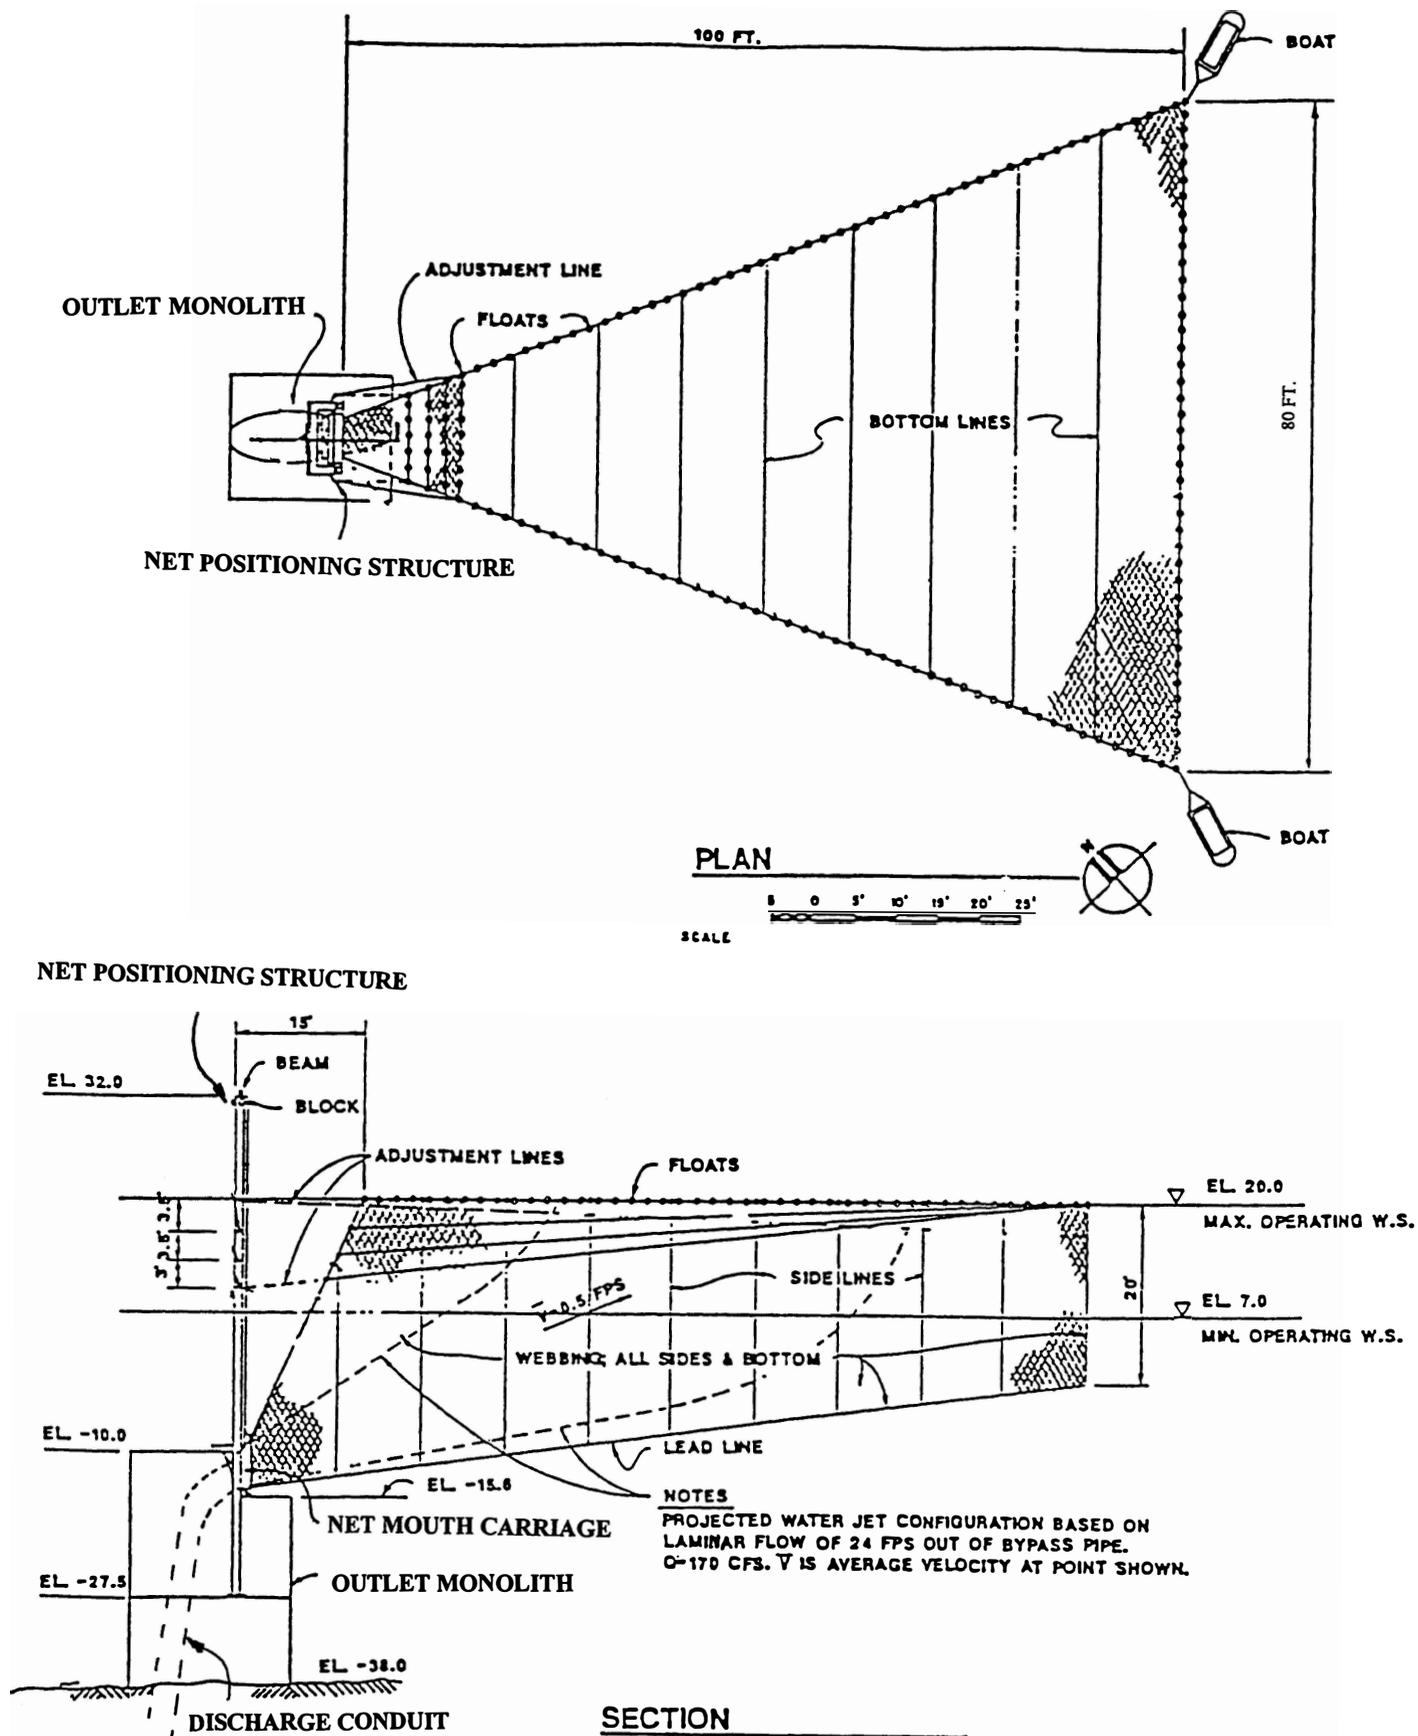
Plan and section views of the trap-net used to intercept test fish exiting the bypass discharge conduit.
